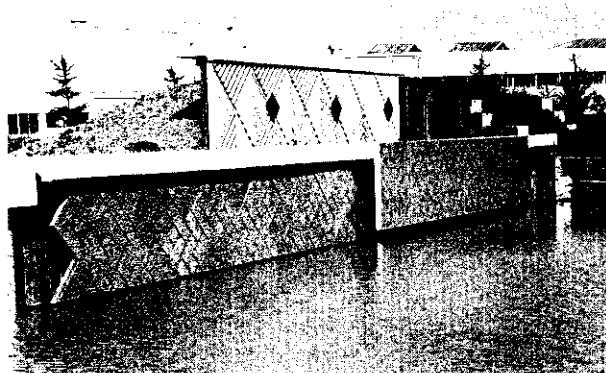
Full-scale model revetment covered with concrete panels (Upper, relief pattern; lower left, stony pattern; lower right, tile pattern)
